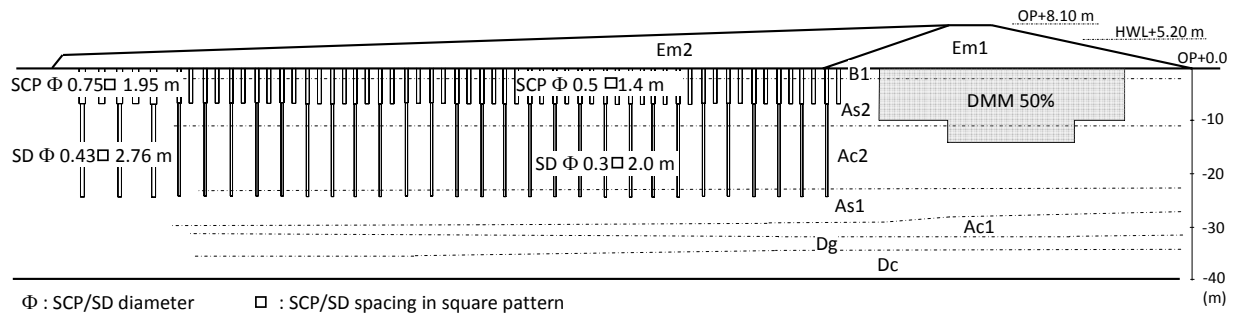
Cross section of the Torishima super levee, soil profile, and ground-improvement techniques.
